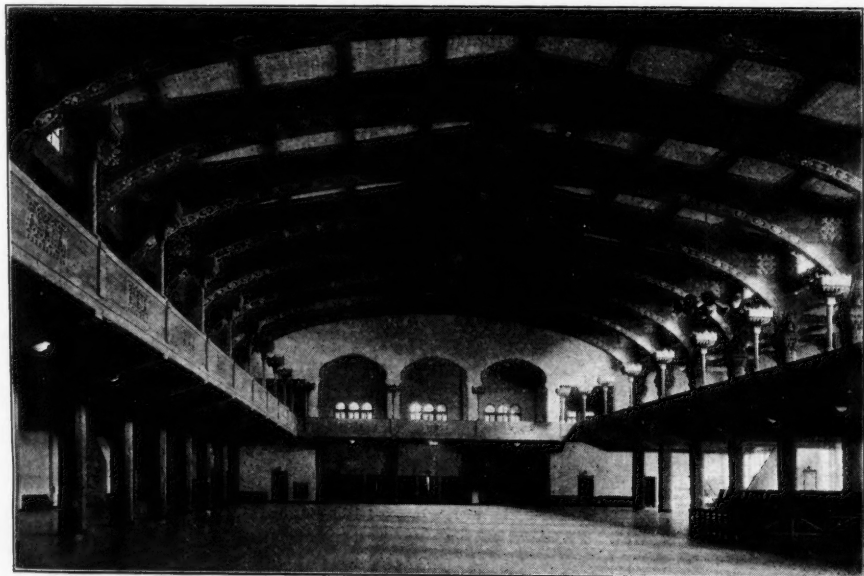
CONTINUOUS ROOF GIRDERS IN BANQUET HALL, SPAN 90 FEET. ANCHOR ARMS PROJECTED ABOVE LOWER ROOF LEVEL. DECORATIONS APPLIED DIRECTLY ON CONCRETE.
